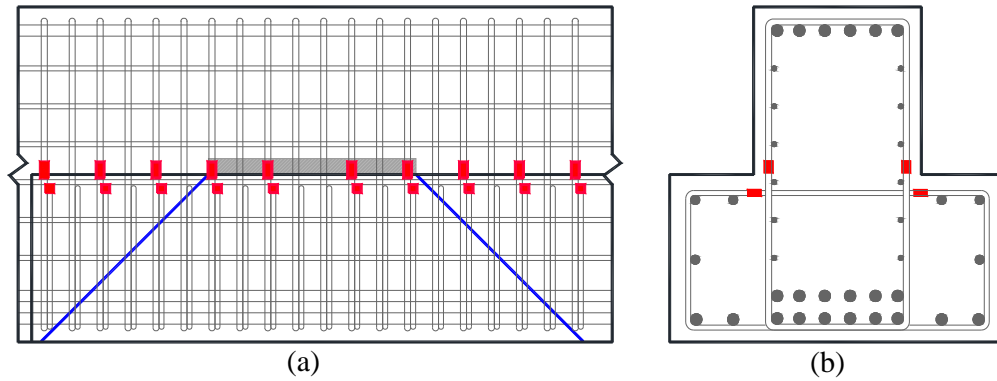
Typical ledge and hanger gage locations; (a) longitudinal and (b) cross-sectional views
